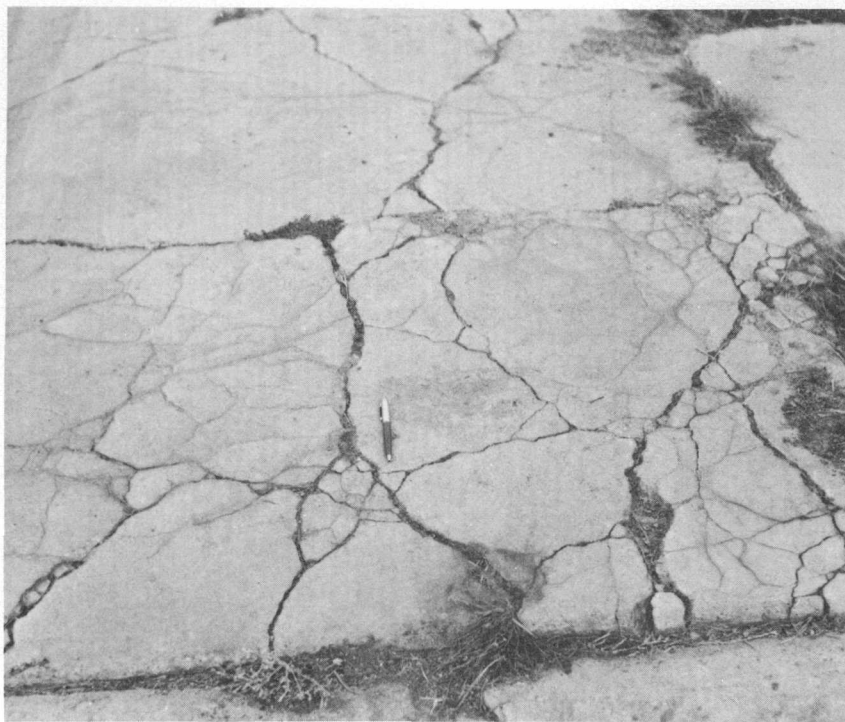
Destruction of sidewalk by sulfate reaction at 1605 32d Street, Pueblo, Colo. The sidewalk is underlain by Apache Creek Sandstone Member of the Pierre Shale, from which seeps a strong sodium sulfate solution at many places in this neighborhood.
